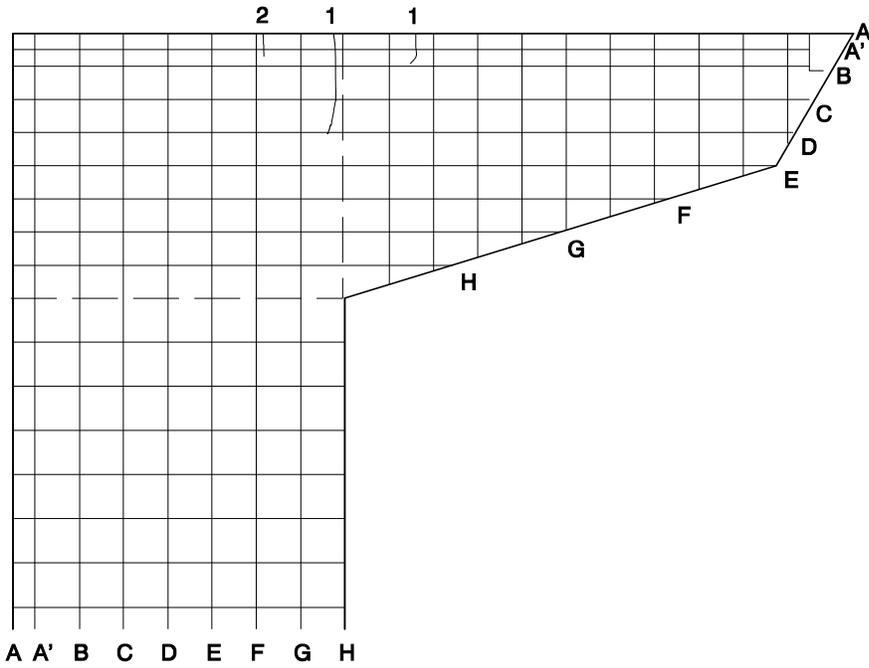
Cracking patterns on north face of Specimen POJ-PU-74-TH at dead load
